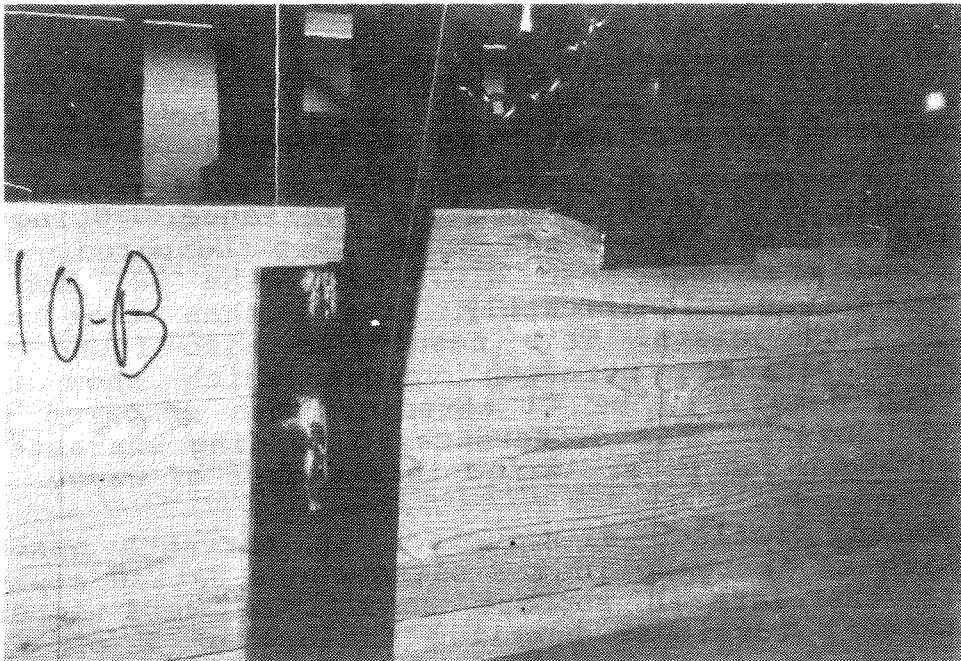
BEARING FAILURE OF SHEAR SPECIMENS
